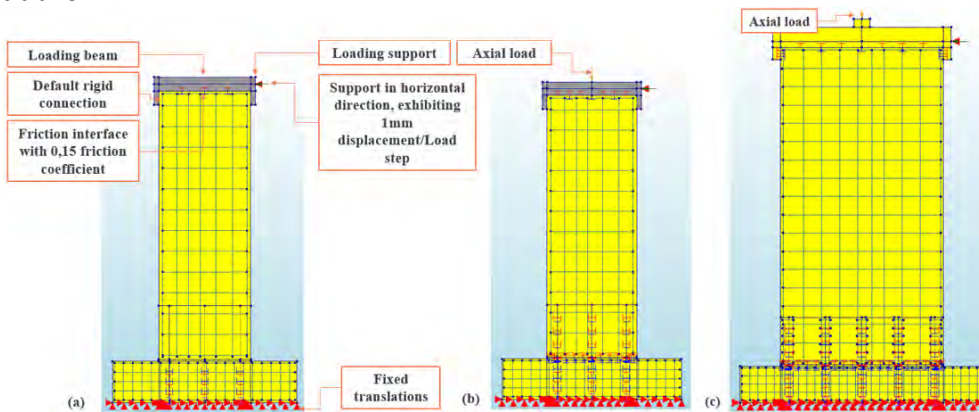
2D plane stress model for a) Wall 1, 4, b) Wall 5 and c) Wall 7
